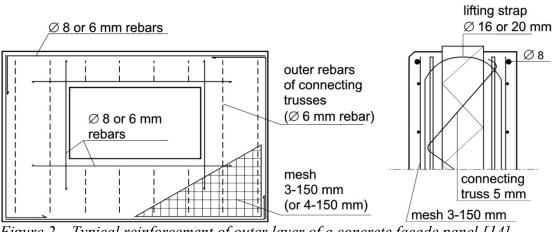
Typical reinforcement of outer layer of a concrete facade panel [14].
